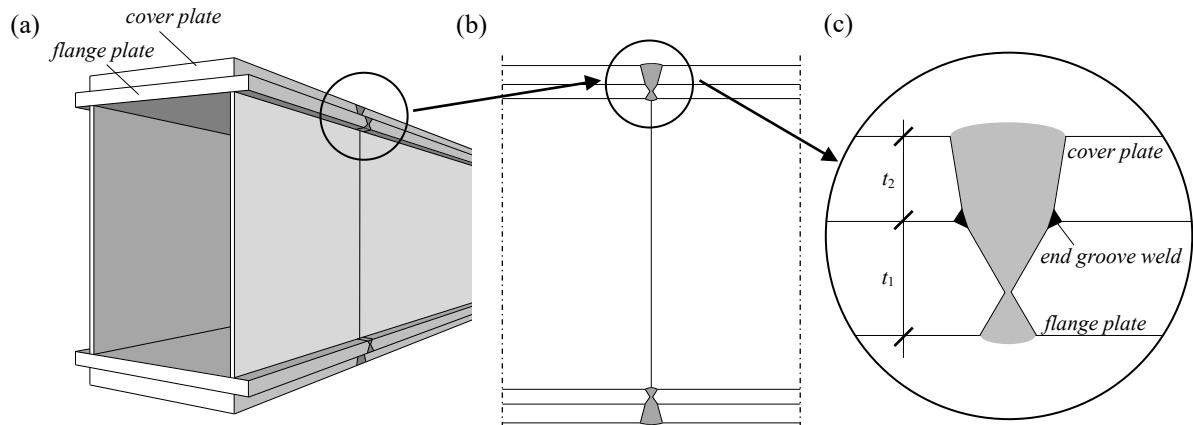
Welding detail lamellae joint: (a) and (b) overview, (c) detail.
